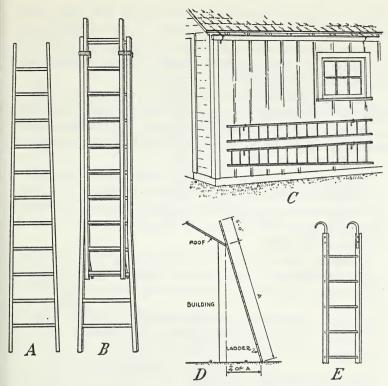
A, Straight ladder; B, extension ladder; C, ladders on side of building; D, setting the ladder; E, roof ladder with hooks.
